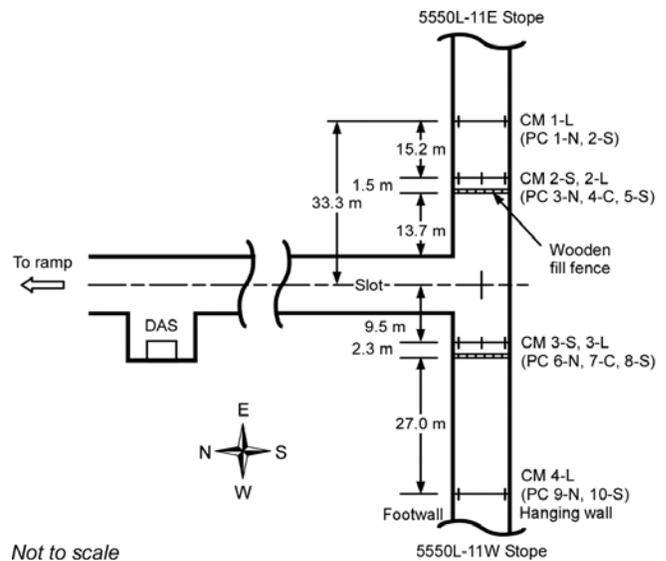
Plan view of 5550-level, 11-stope backfill instrumentation sites.
